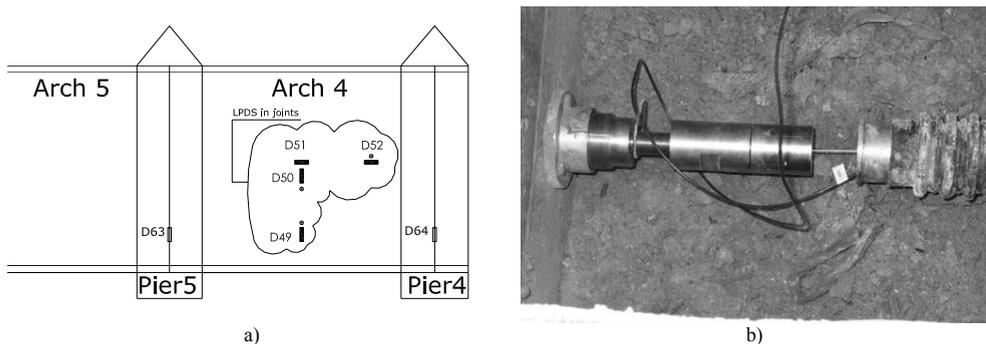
Optical displacement transducers: a) layout in arch intrados and between spandrel walls; b) transversal long gage.
